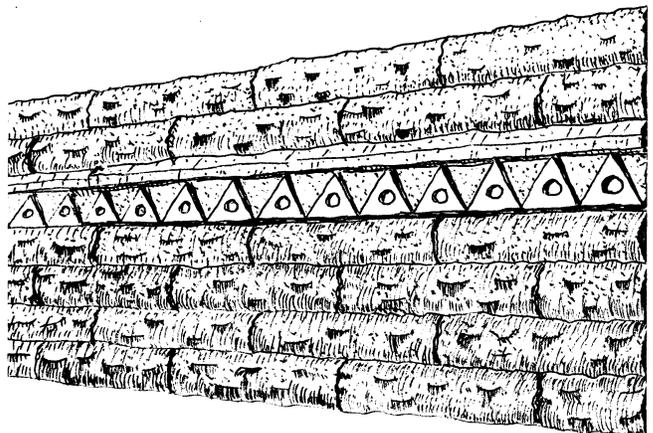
Detail, north wall, St. James Evangelical Lutheran Church (9).
